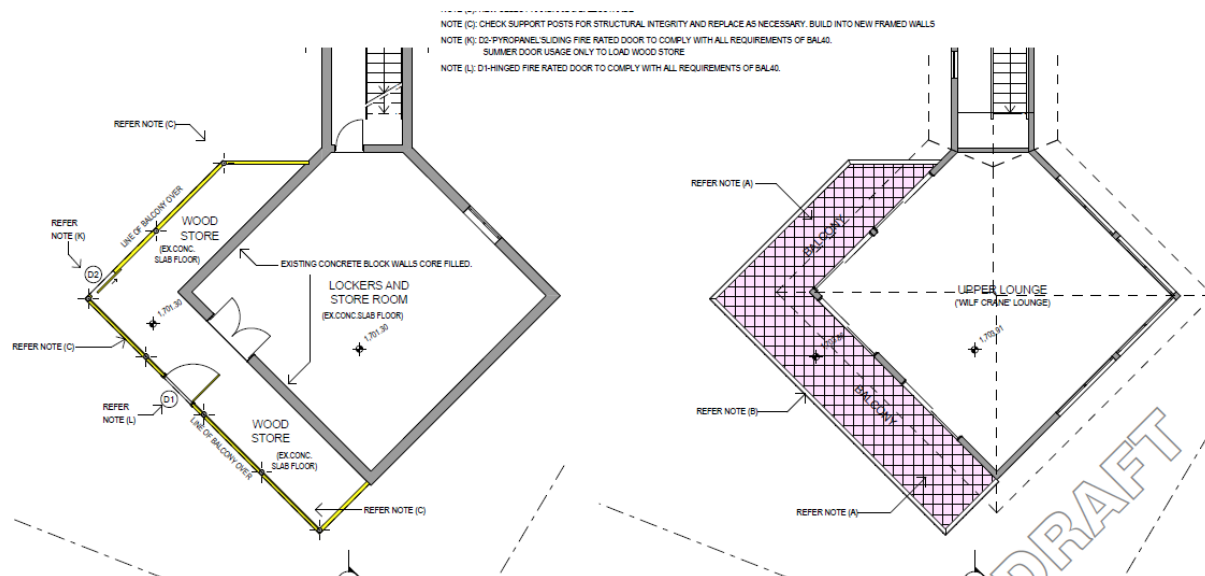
| Proposed wood store location off locker / storage room (Source: Applicant's documentation)
